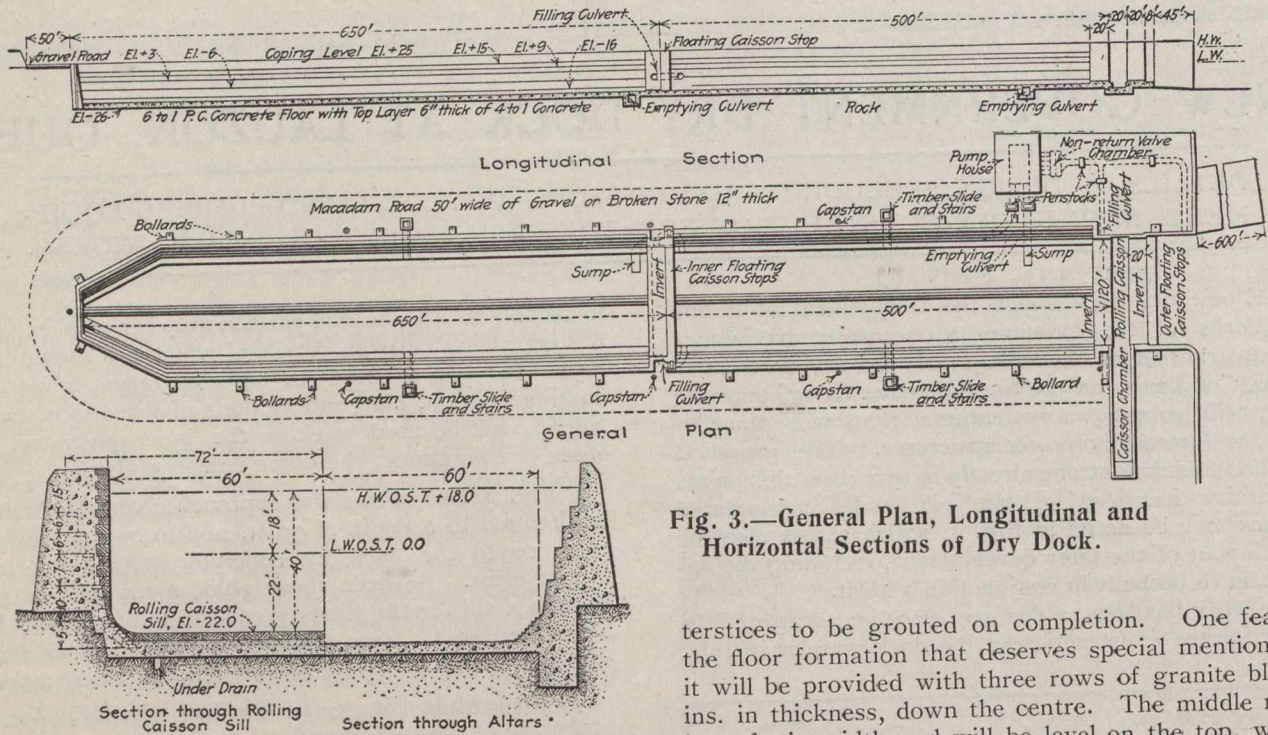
General Plan, Longitudinal and Horizontal Sections of Dry Dock.
